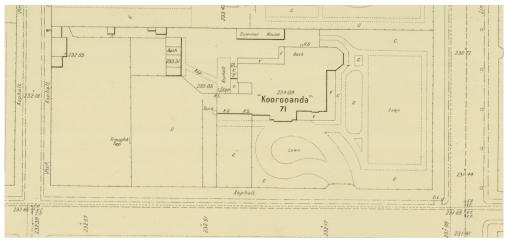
The original residence at 53 Walpole Street, Kew (formerly addressed as 71 Malmsbury Street), shown in MMBW Detail Plan No. 1583, dated 1904. The house 'Koorooanda' was set on a large block with generous areas of garden to the south and east. (Source: State Library Victoria)
